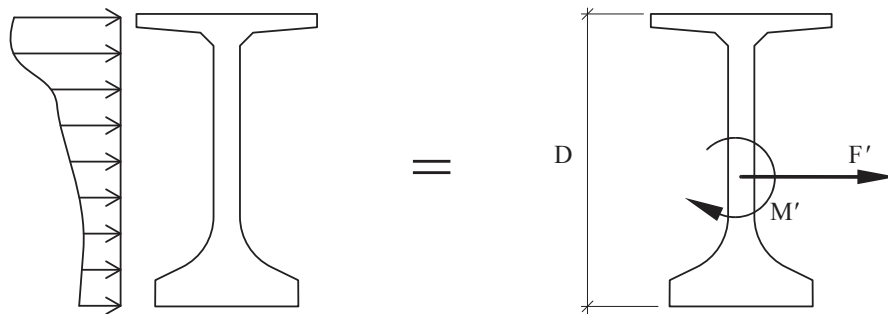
Two-dimensional bridge girder cross-section with in-plane line loads
